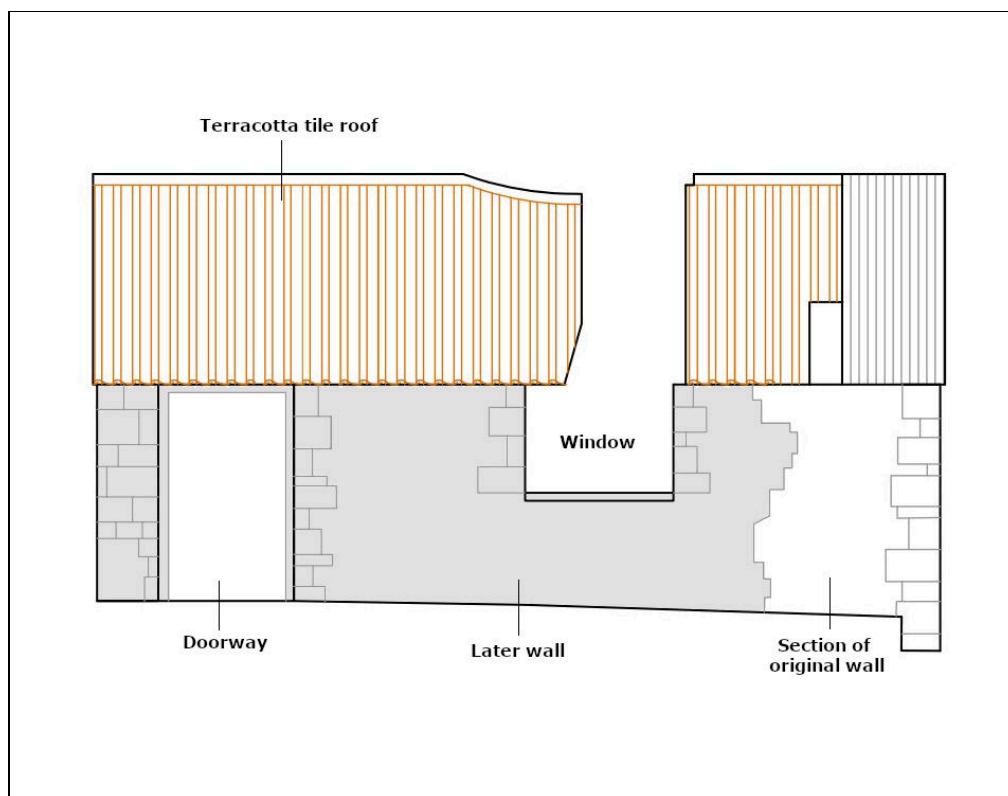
The northern elevation, showing the original wall in white and the later wall in grey. Most of the terracotta roof tiles recorded on this elevation when drawn in 2017 have now been lost. (Source: Heron Associates, 2017. Originally drawn at 1:50 but not to scale here, and with annotations by Trysor, 2020).
